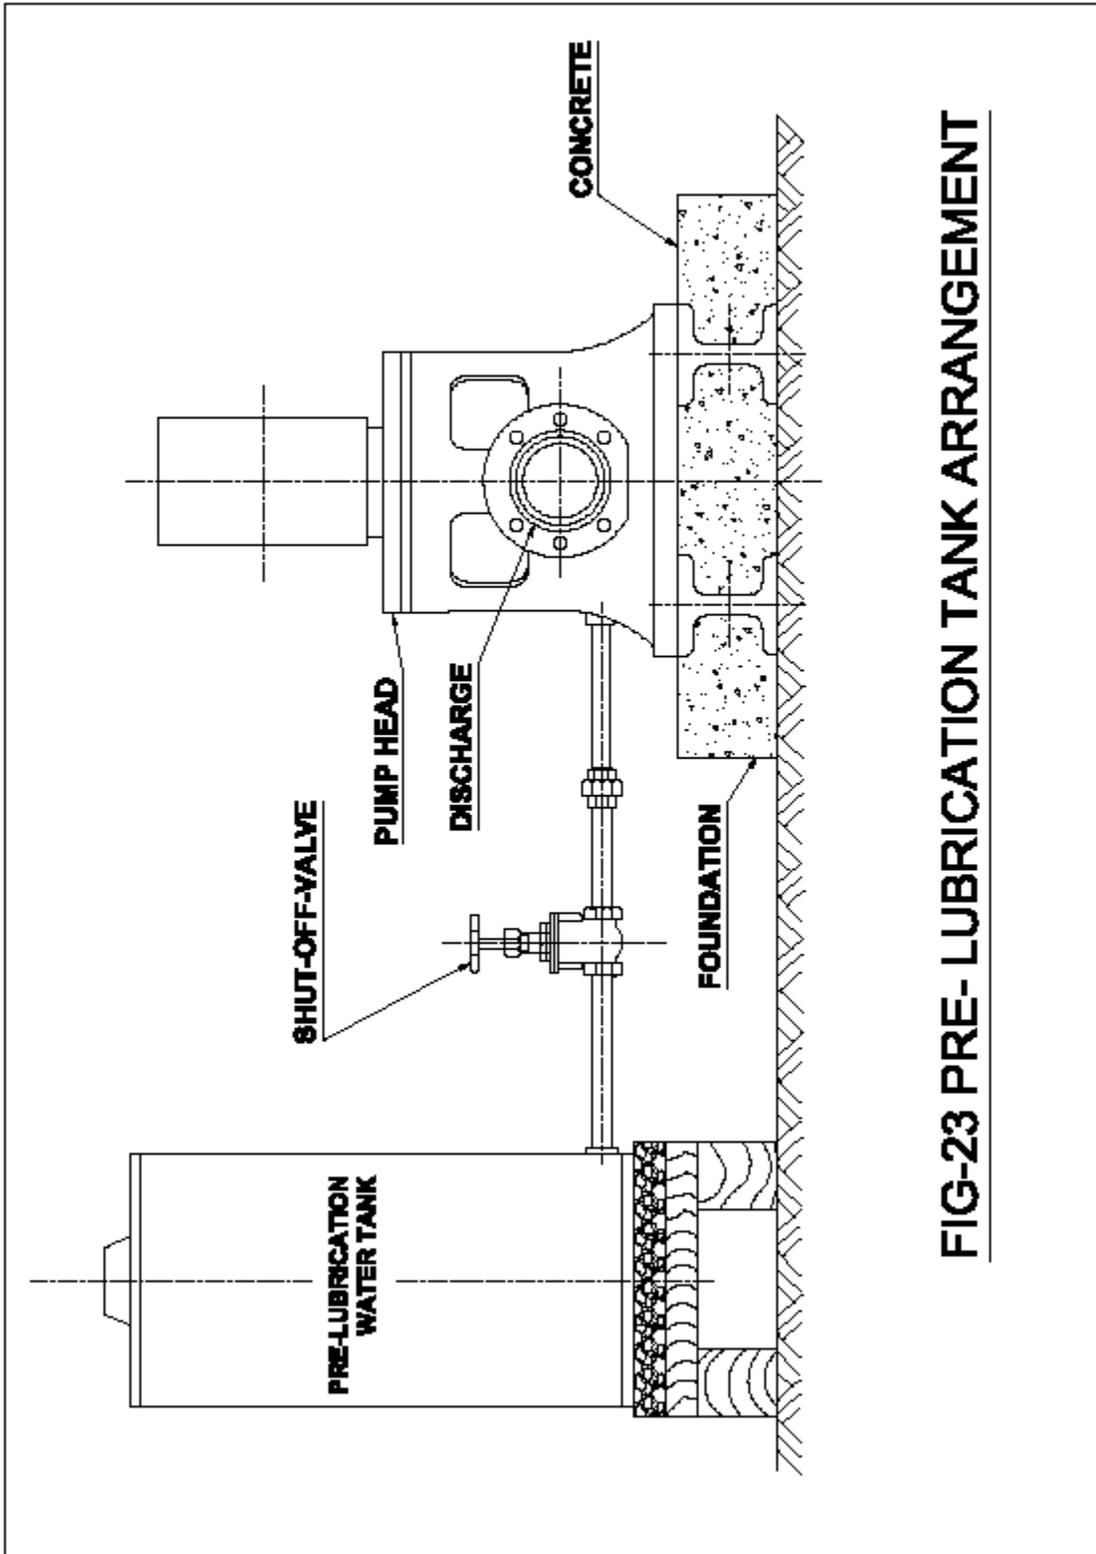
PRE- LUBRICATION TANK ARRANGEMENT
